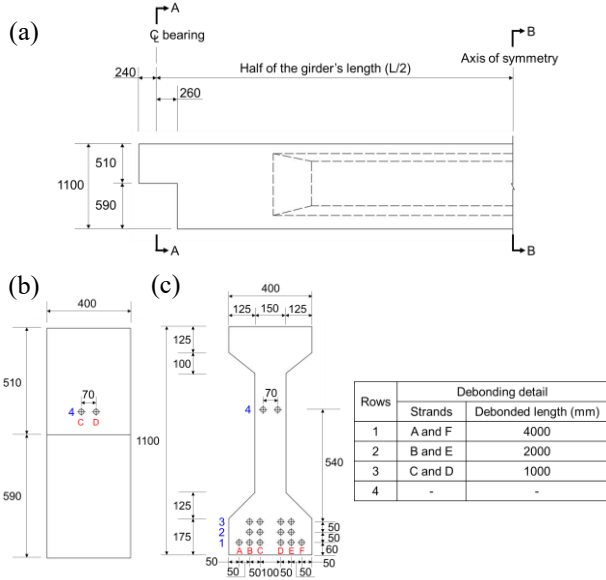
Girder details; a) Side view, b) Section A-A, and c) Section B-B (Unit: mm)
